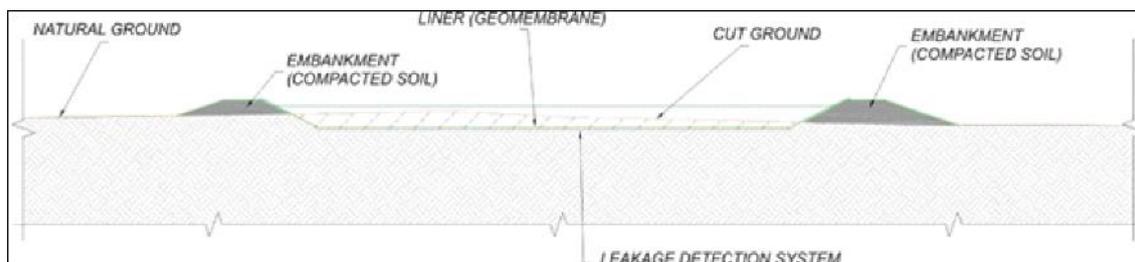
Typical Cross-Section of the Chloride Control Purge Pond
